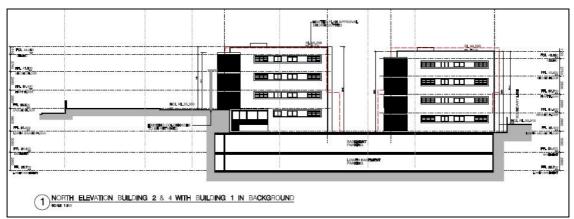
Northern elevation of buildings 2 and 4, comparative height with concept plan shown dotted in red.
